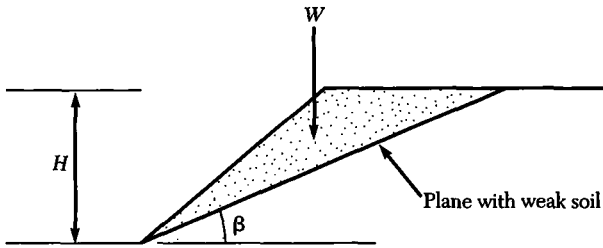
Typical cross section for a finite dam with a weak layer.
